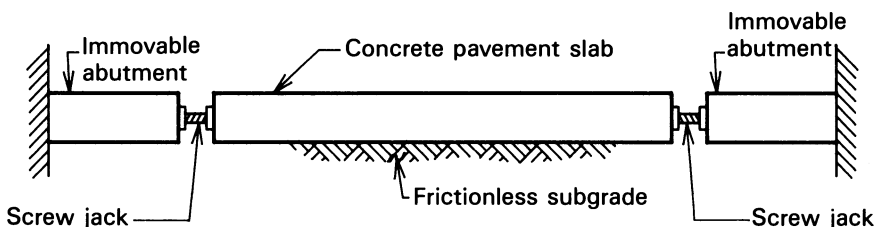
Concrete pavement slab prestressed with screw jacks.
